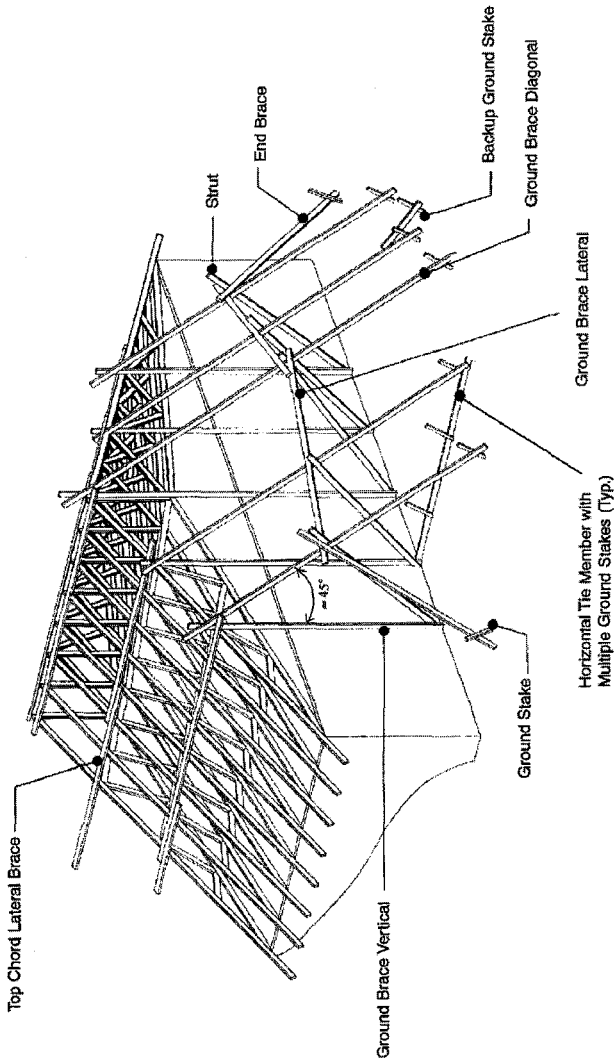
Ground Bracing Description (LGSEA 1998a)
